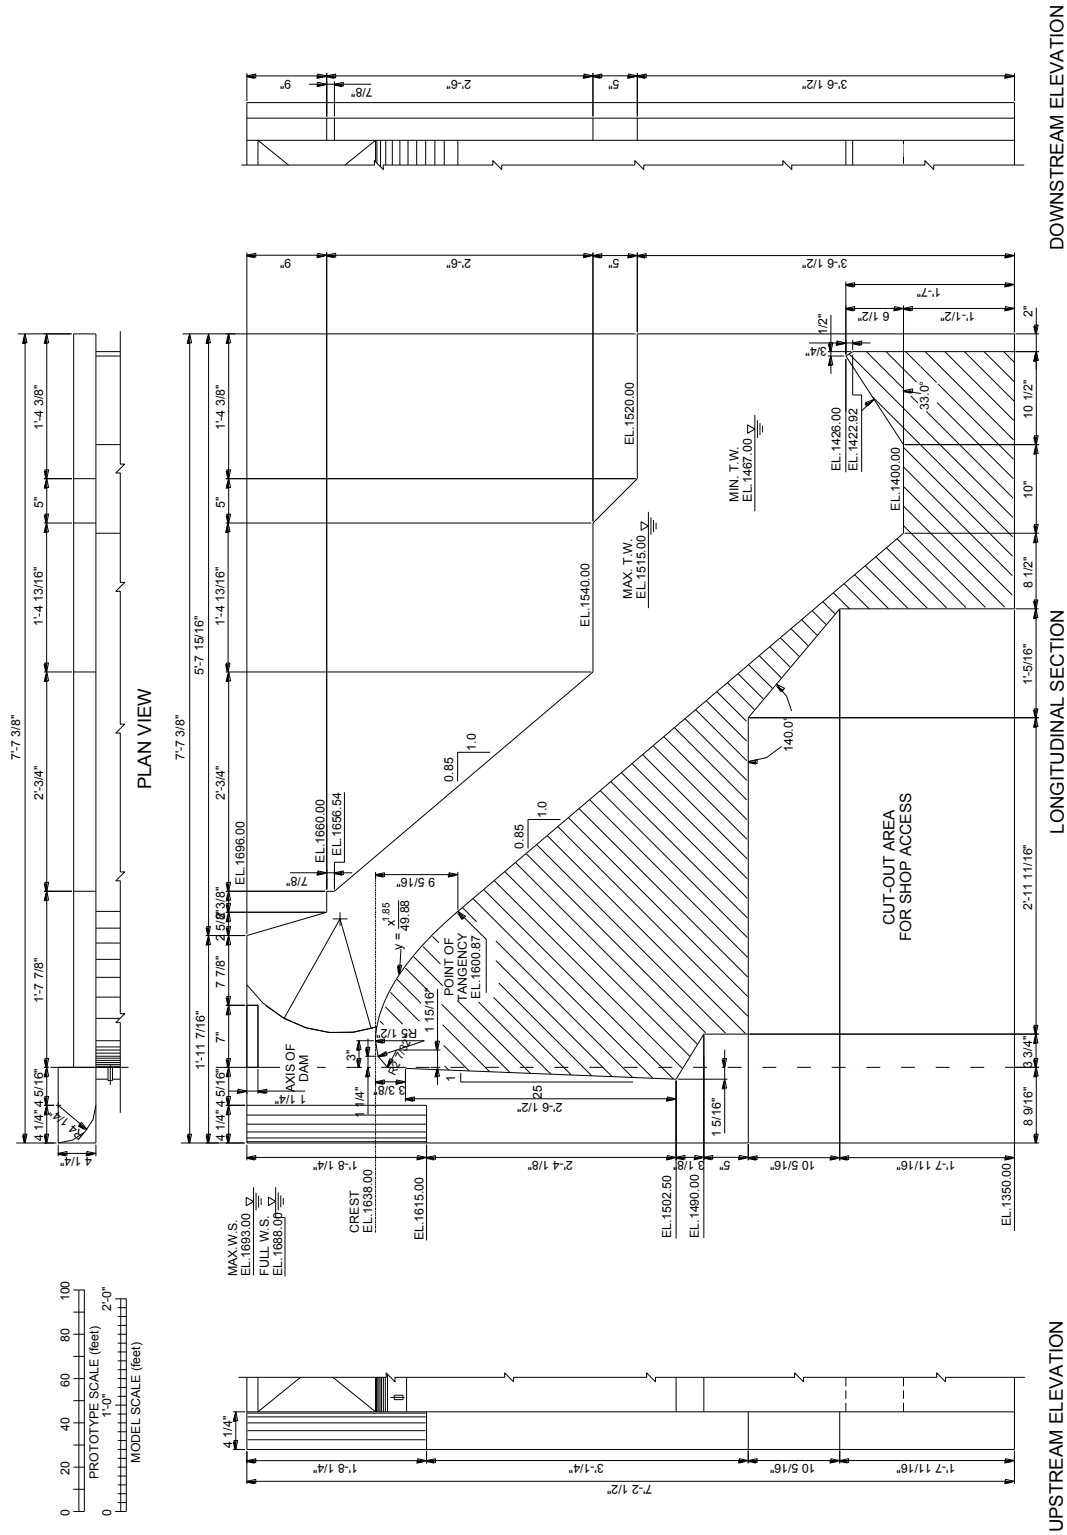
Plan, Elevation, and Section of Left Guide Wall for 1:48 Sectional Model
